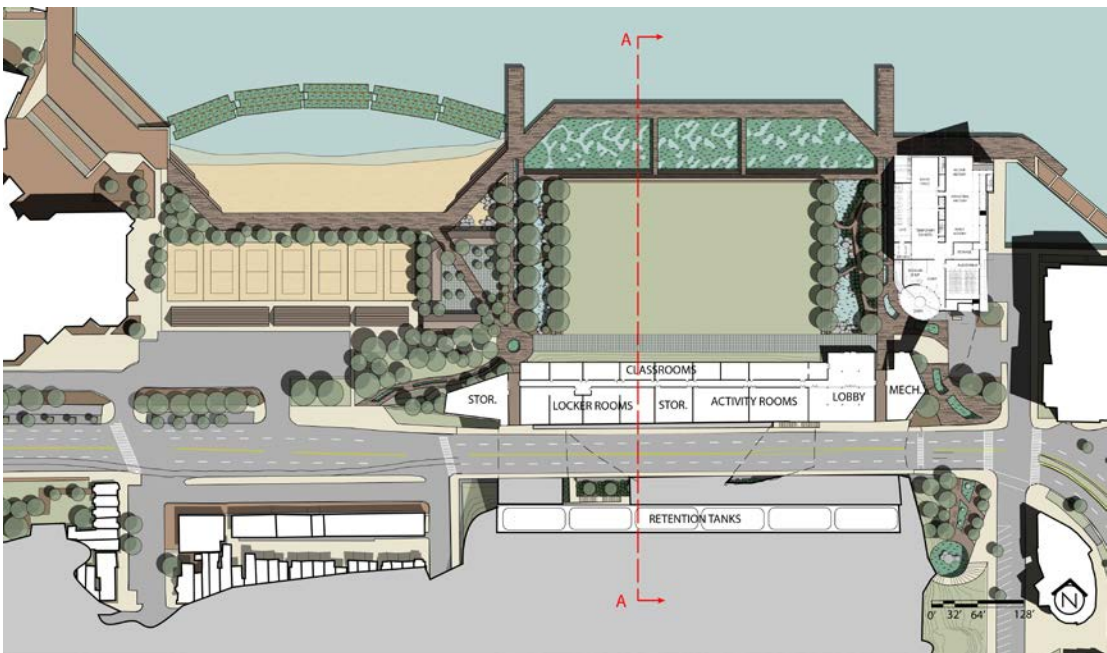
Site plan, first floor, Final design scheme, image by author.
